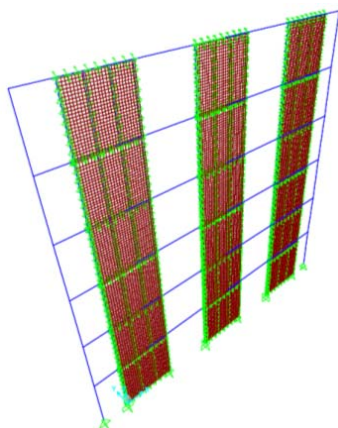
3-D view of 6-storey multiple walls with the beam at each storey level representing the diaphragm
